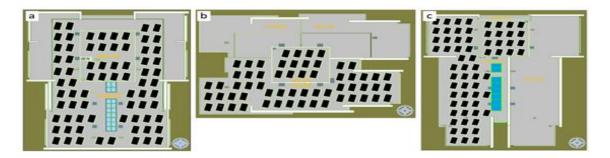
Photovoltaic panel application in base buildings; a) Block B base building, b) Block D base building, c) Block F base building.
